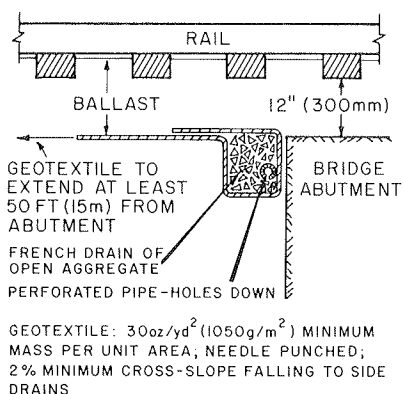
Typical method of rehabilitating bridge abutments using geotextiles.
